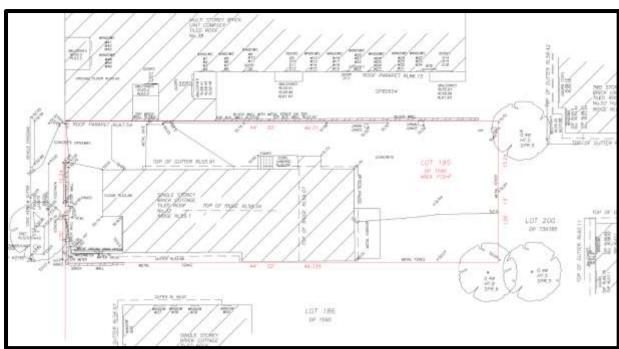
Extract of survey of subject site 32 The Avenue, Hurstville (Source: Maps and Surveys, 2018)
